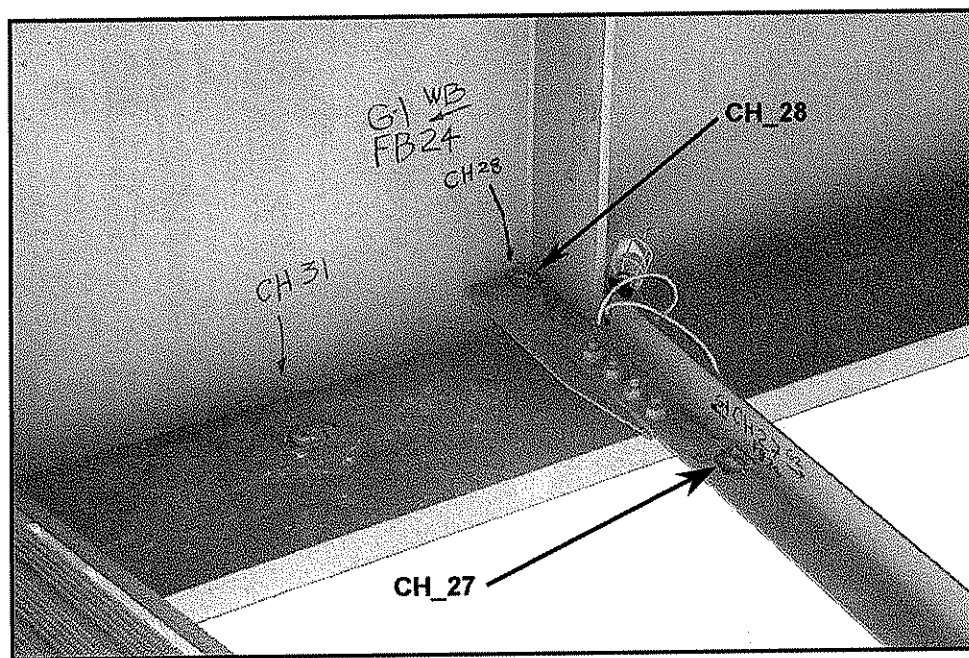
Photograph of strain gages installed on lateral strut (CH_27) and on gusset plate connected to web and transverse connection plate (CH_28)
